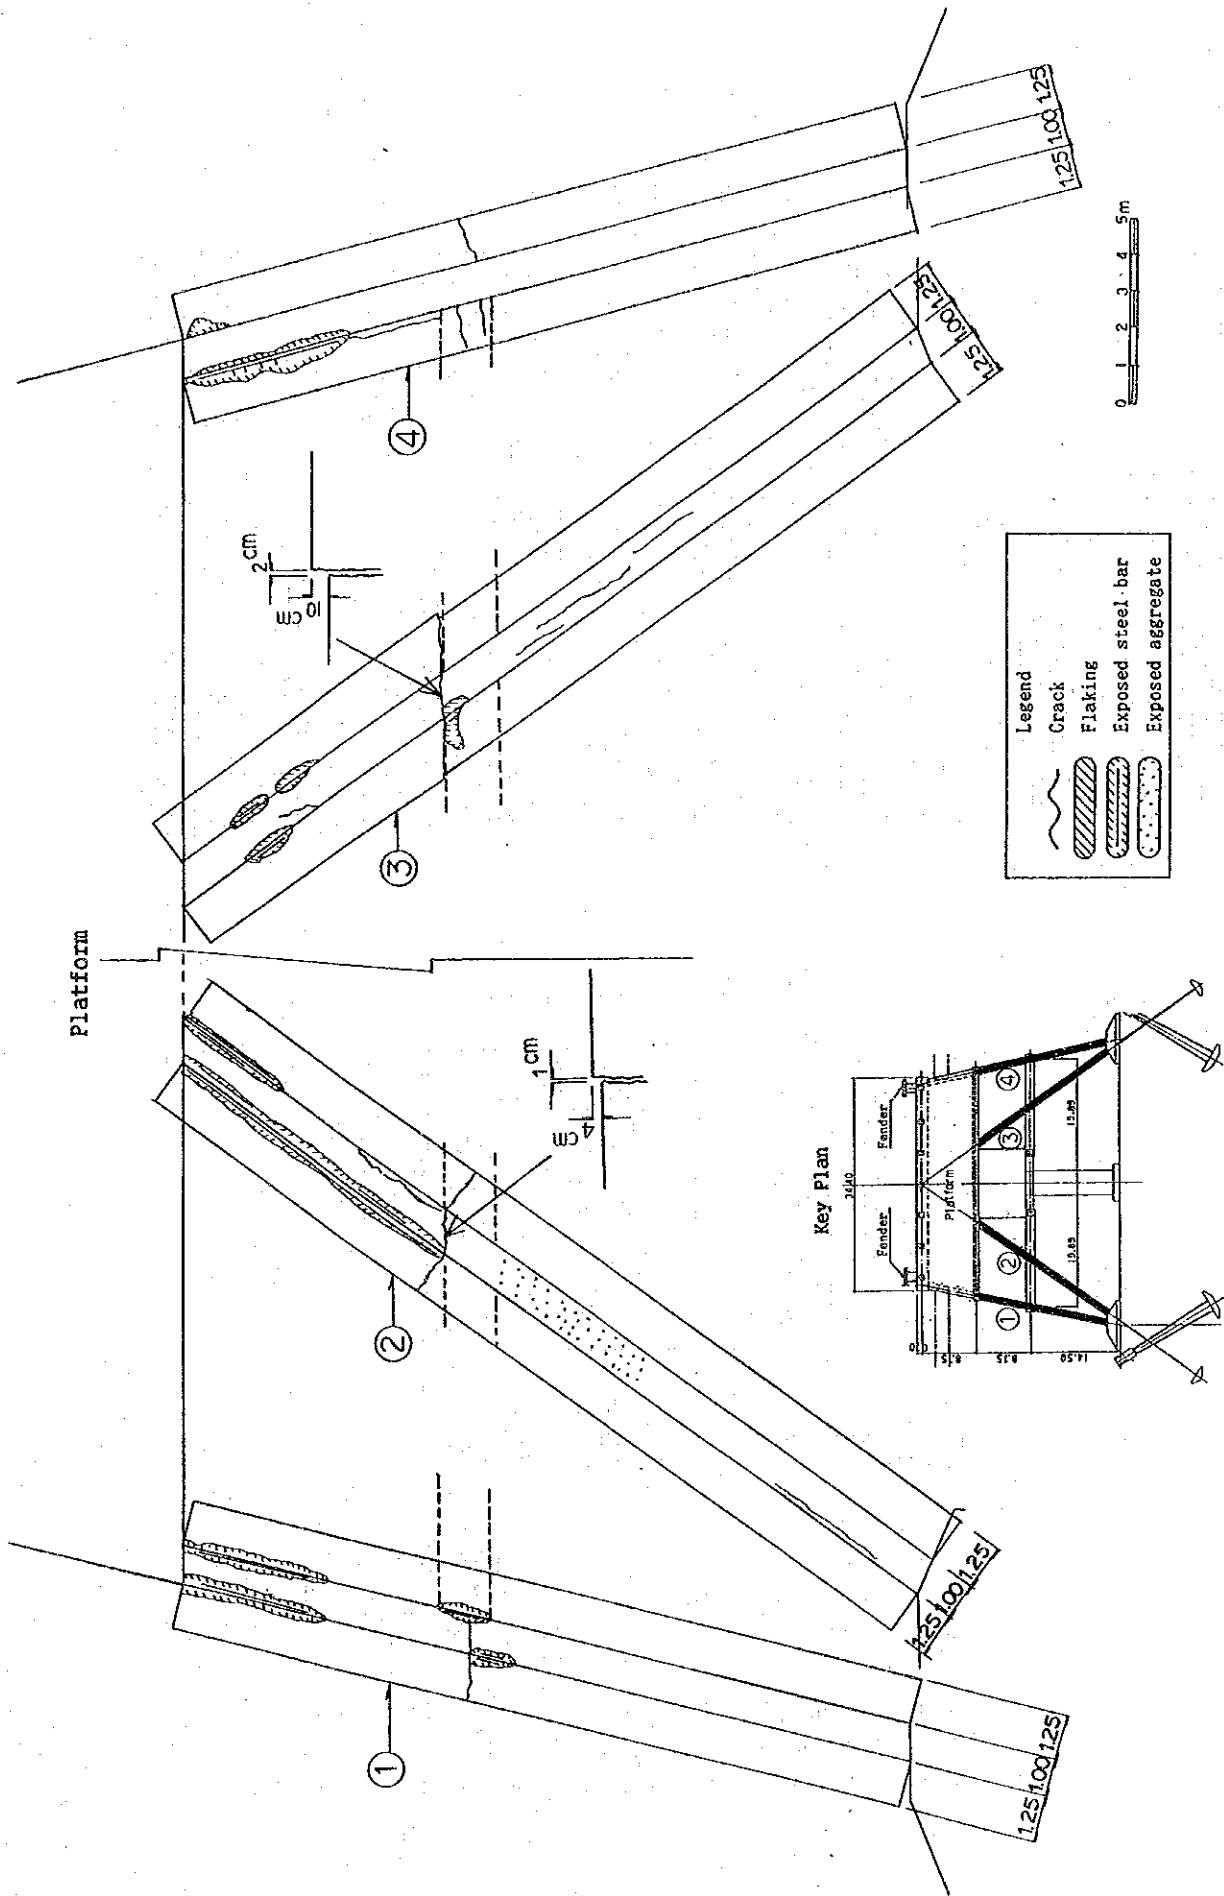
Present Condition of Concrete Beam at Berth No. 12
